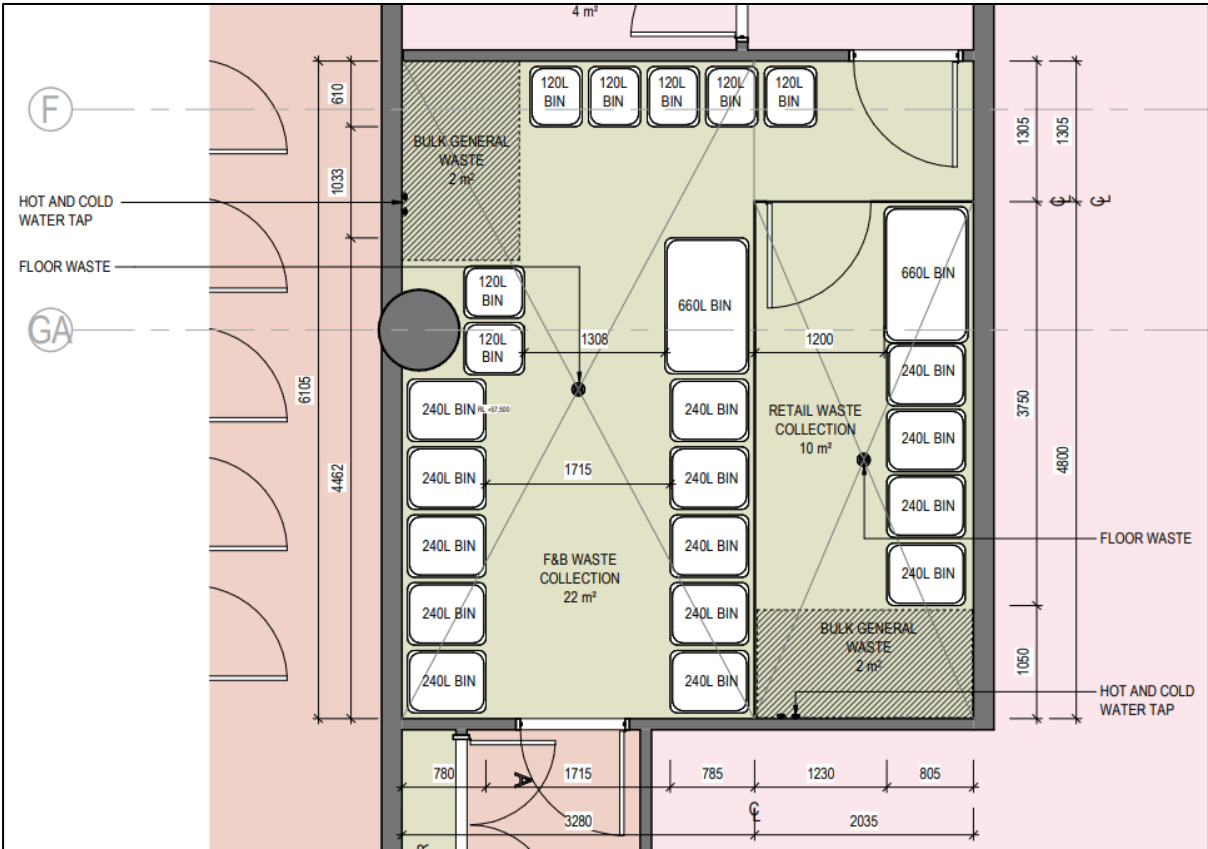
Building A Ground floor plan showing the external operators bin stores location
